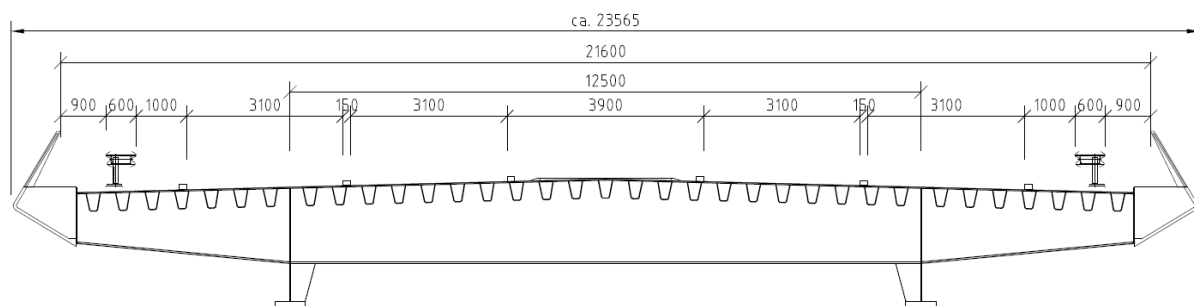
Cross section of the original Amalia bridge (Heijmans, 2015)
